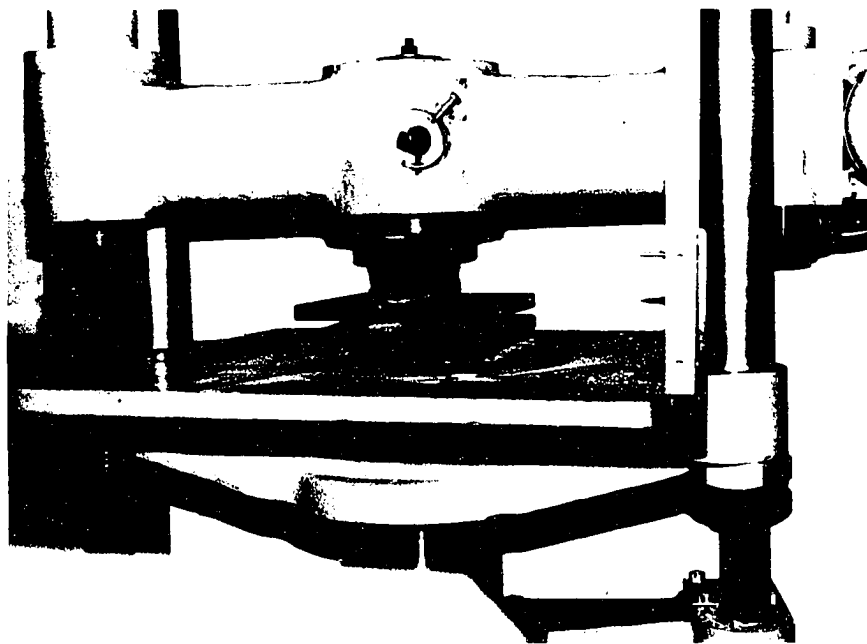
General view of the secured cylindrical concrete specimen prior to splitting tensile strength test.
